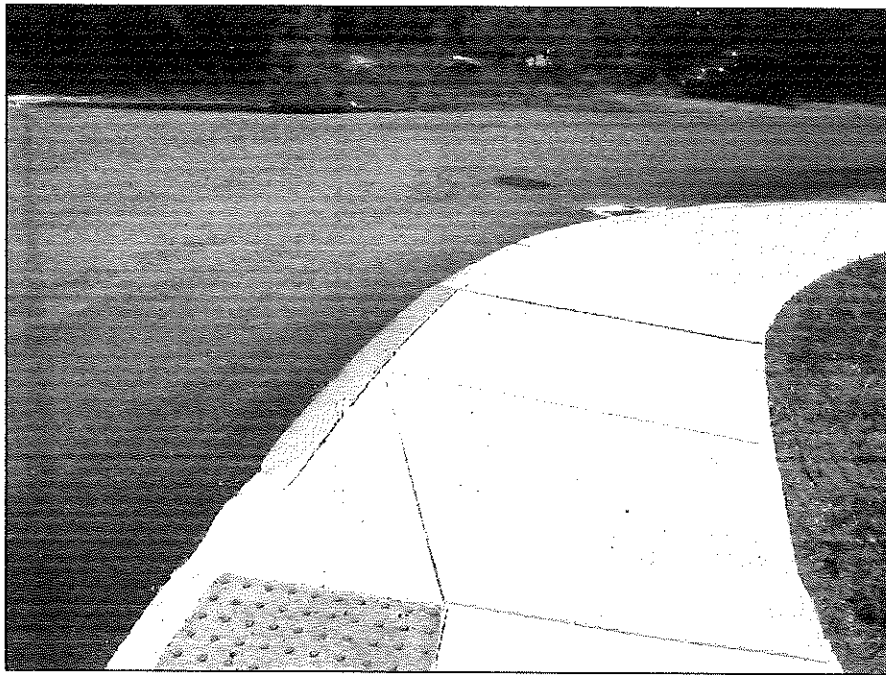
Northeast corner of Wheeler Street – tire tracks on sidewalk and ramp
